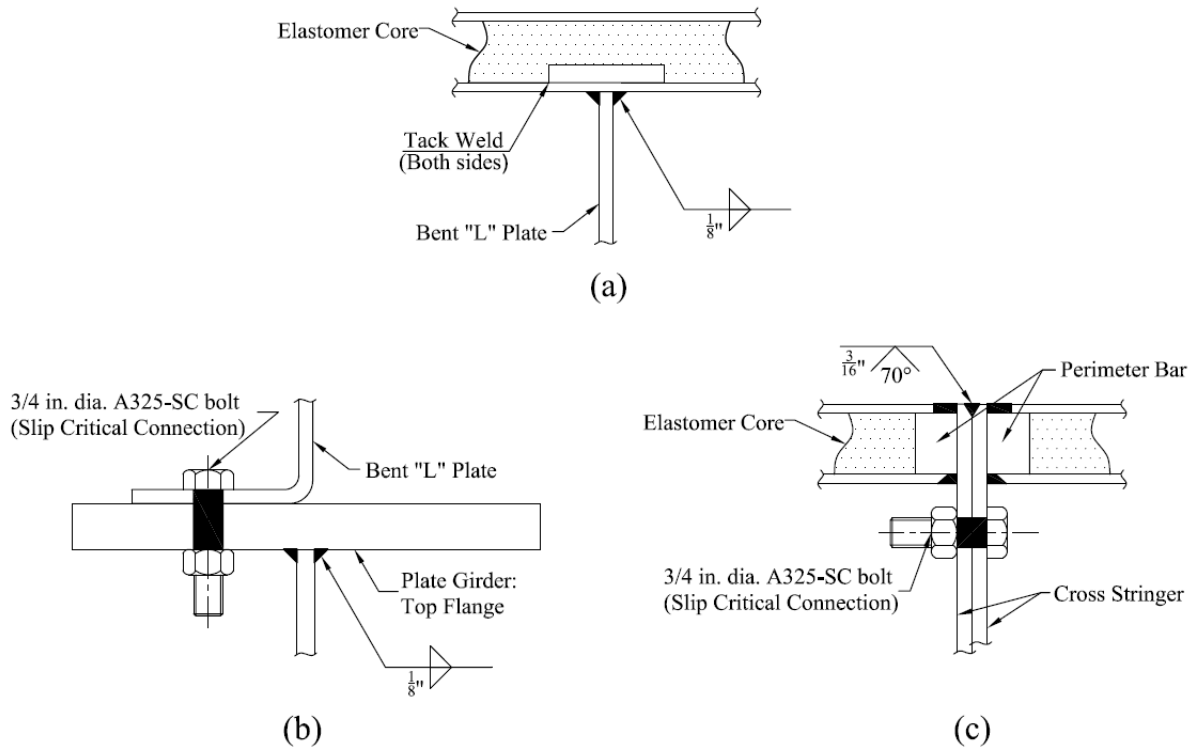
Typical connections in the panel-to-girder and panel-to-panel connections
